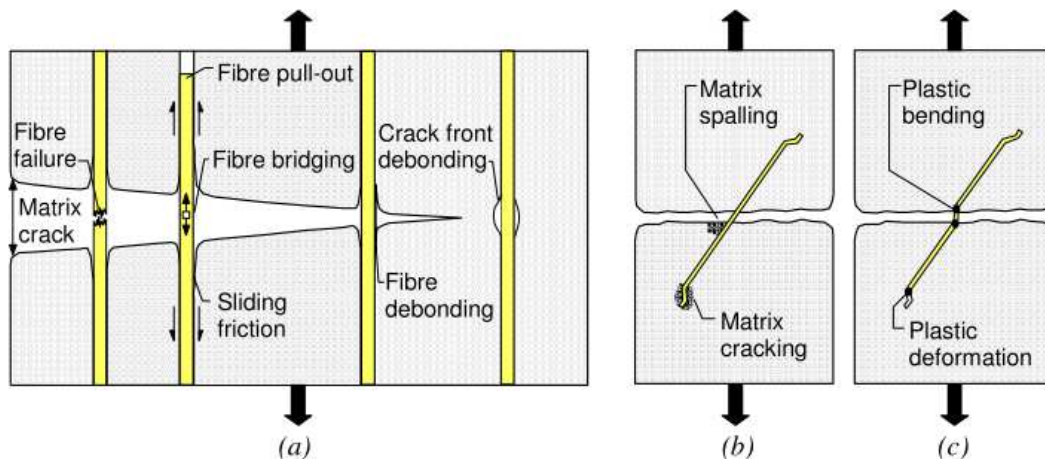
Mechanisms leading to enhanced fracture energy in FRC; a) fibre failure, fibre bridging and fibre pull-out and debonding, b) matrix spalling and cracking, and c) plastic bending and deformation (Löfgren 2005).
